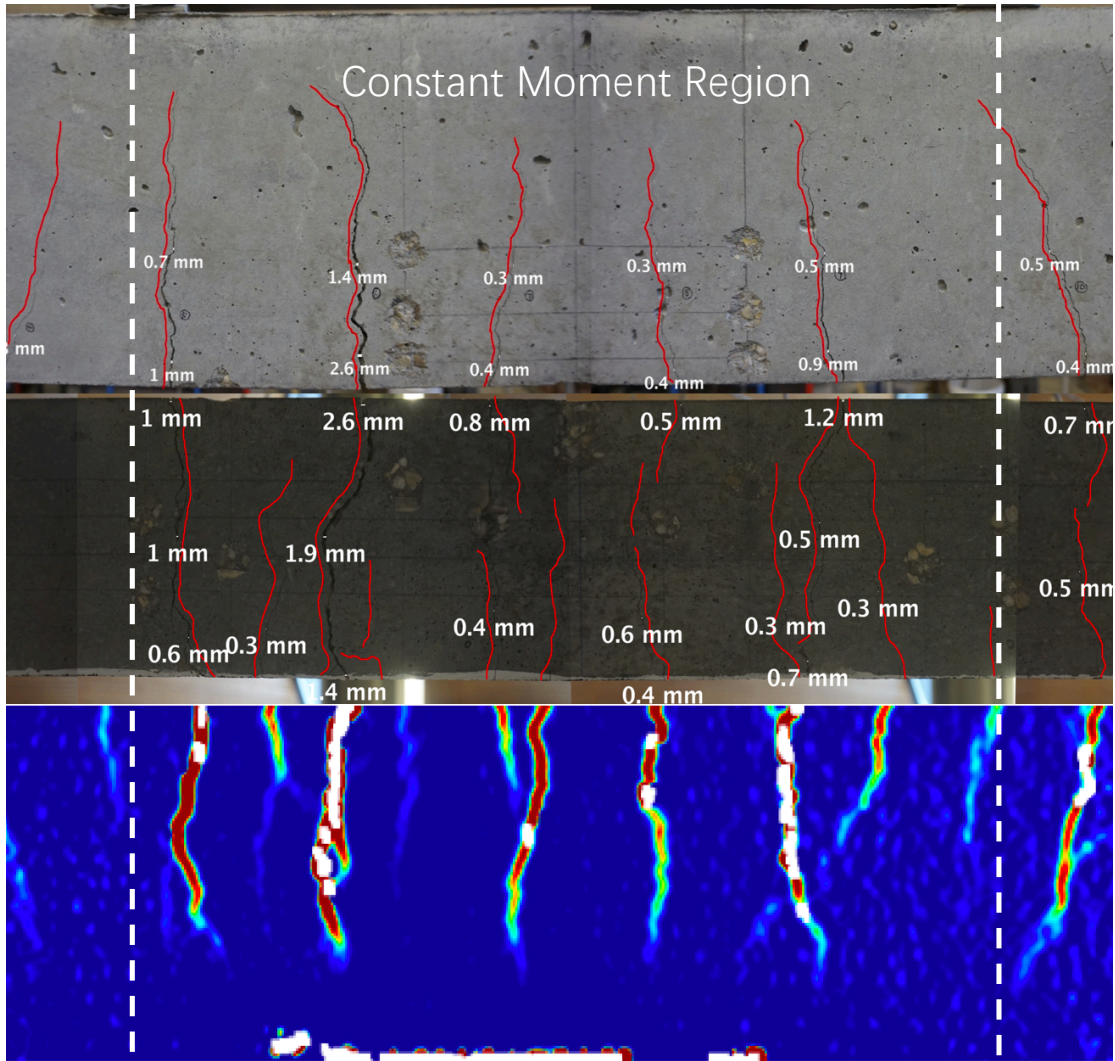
Crack pattern of Test 02 (RC beam with cover of 11 mm)
